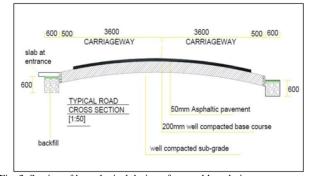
Section of hypothetical design of a trenchless drainage system on a road section.
